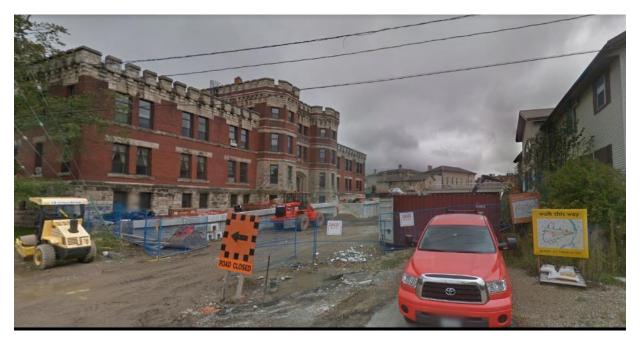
2011 construction on Wyndham Street South and within the Armory grounds.
